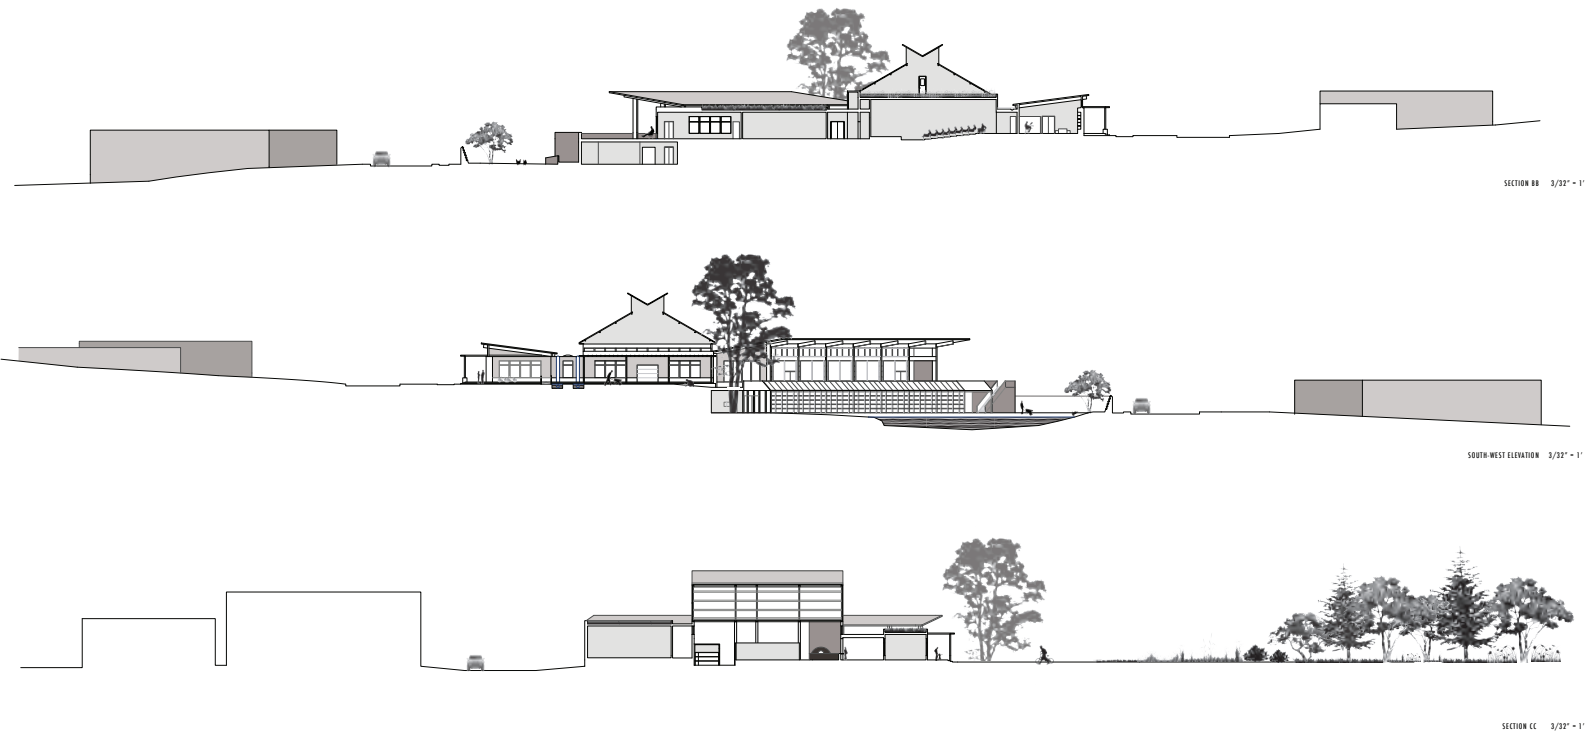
Five Points Community Food Center Sections and Elevations 1. (Author).
